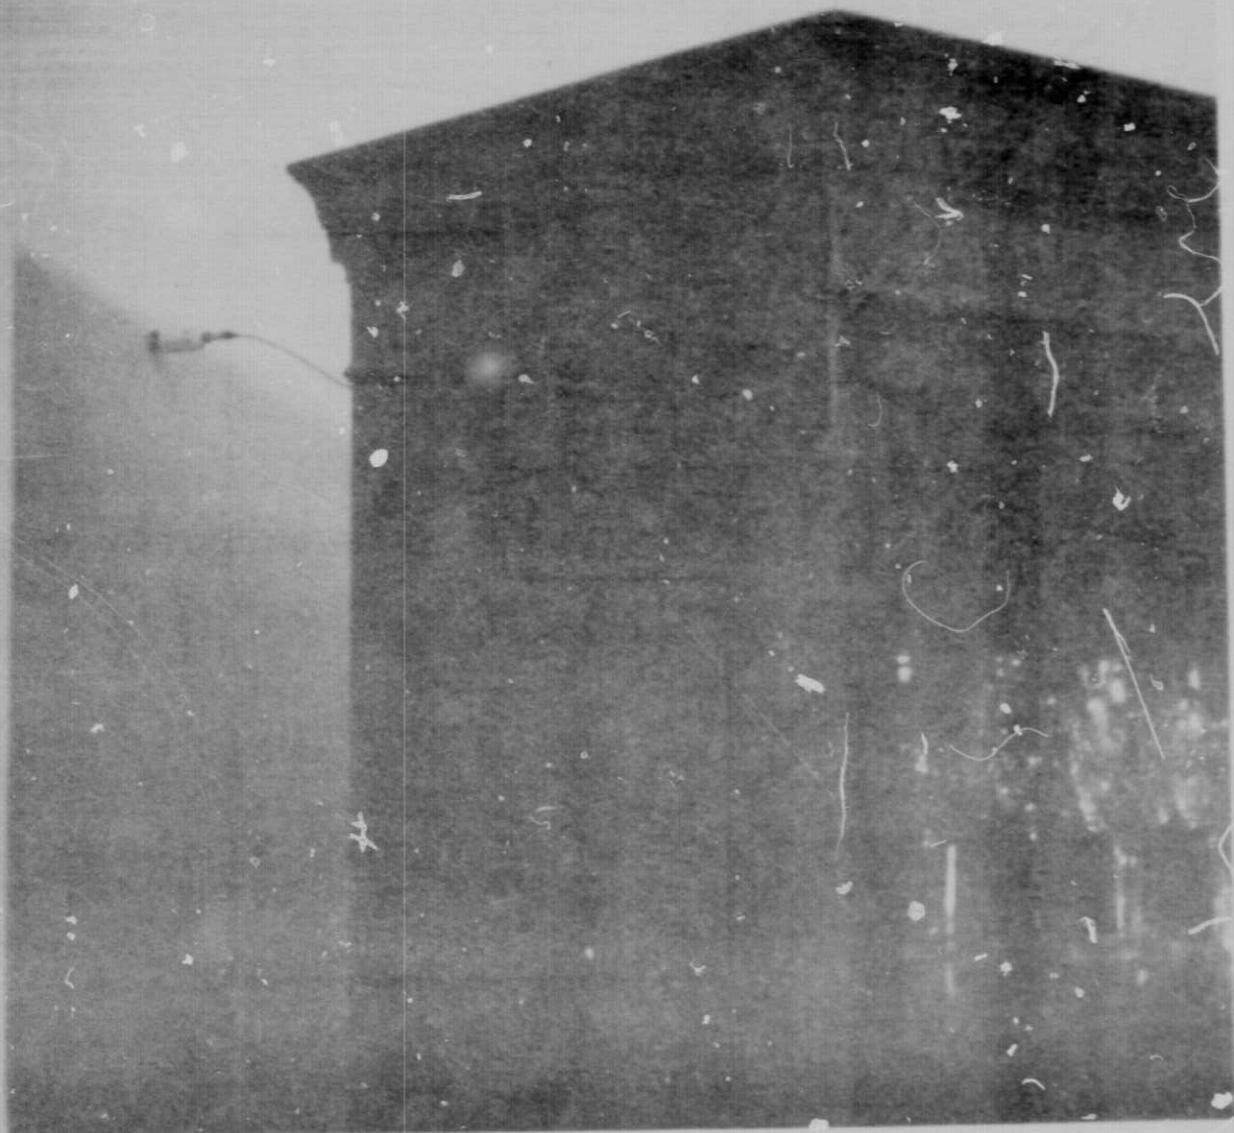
(c). Location of accelerometer for wall vibration measurements. Site 2.
